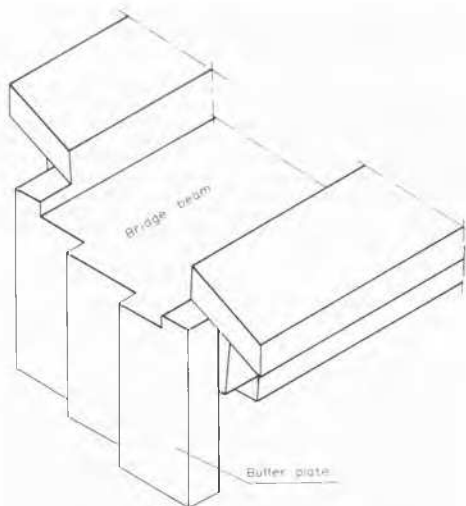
Elements of the bridge abutment according to the new construction scheme
